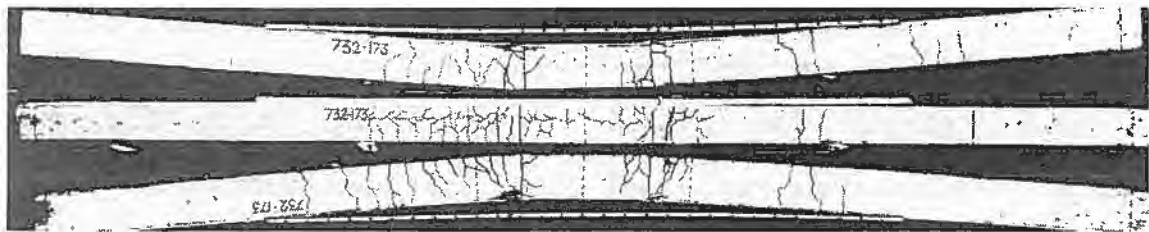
The beam 732-173 after yielding of the tensile reinforcement and failure in the compressive zone close to the middle of the beam. The tension face of the beam is shown in the middle.
